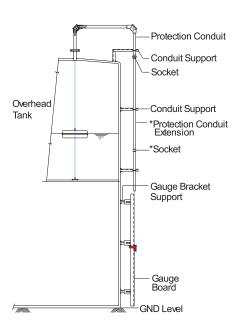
Gauge board with Full Travel, Mounted on Side of Elevated Tank
